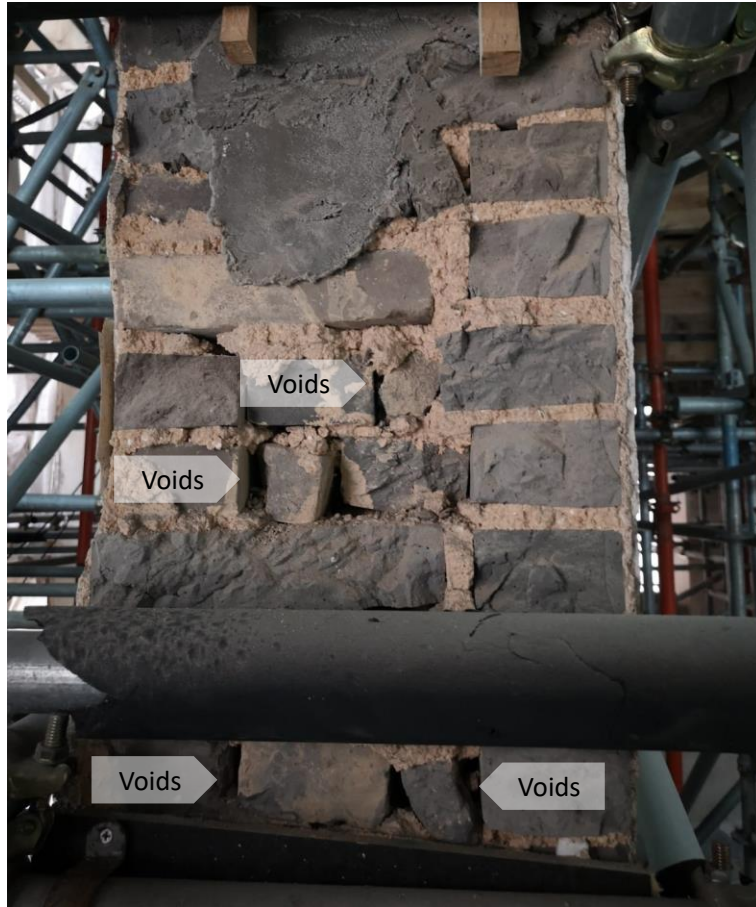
(a) Poor bonding of brickwork, erratic in pattern and level (Location: Wall Zone W6 on G/F)
